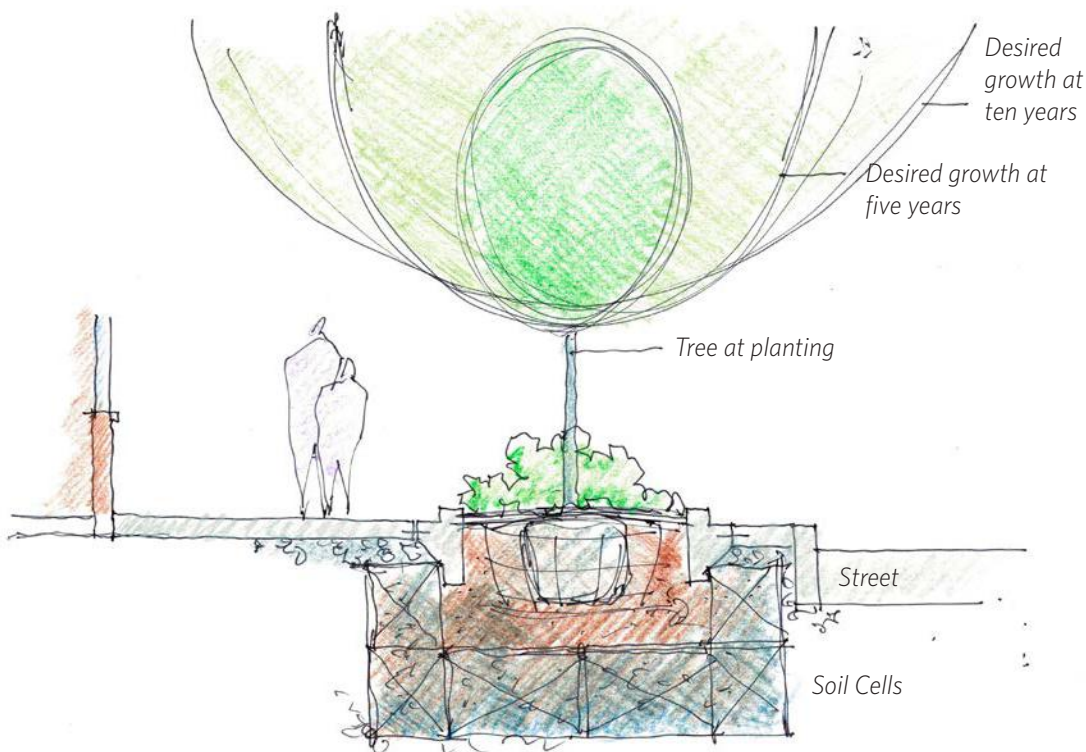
Street Tree Planting Details with Soil Cells — Section
